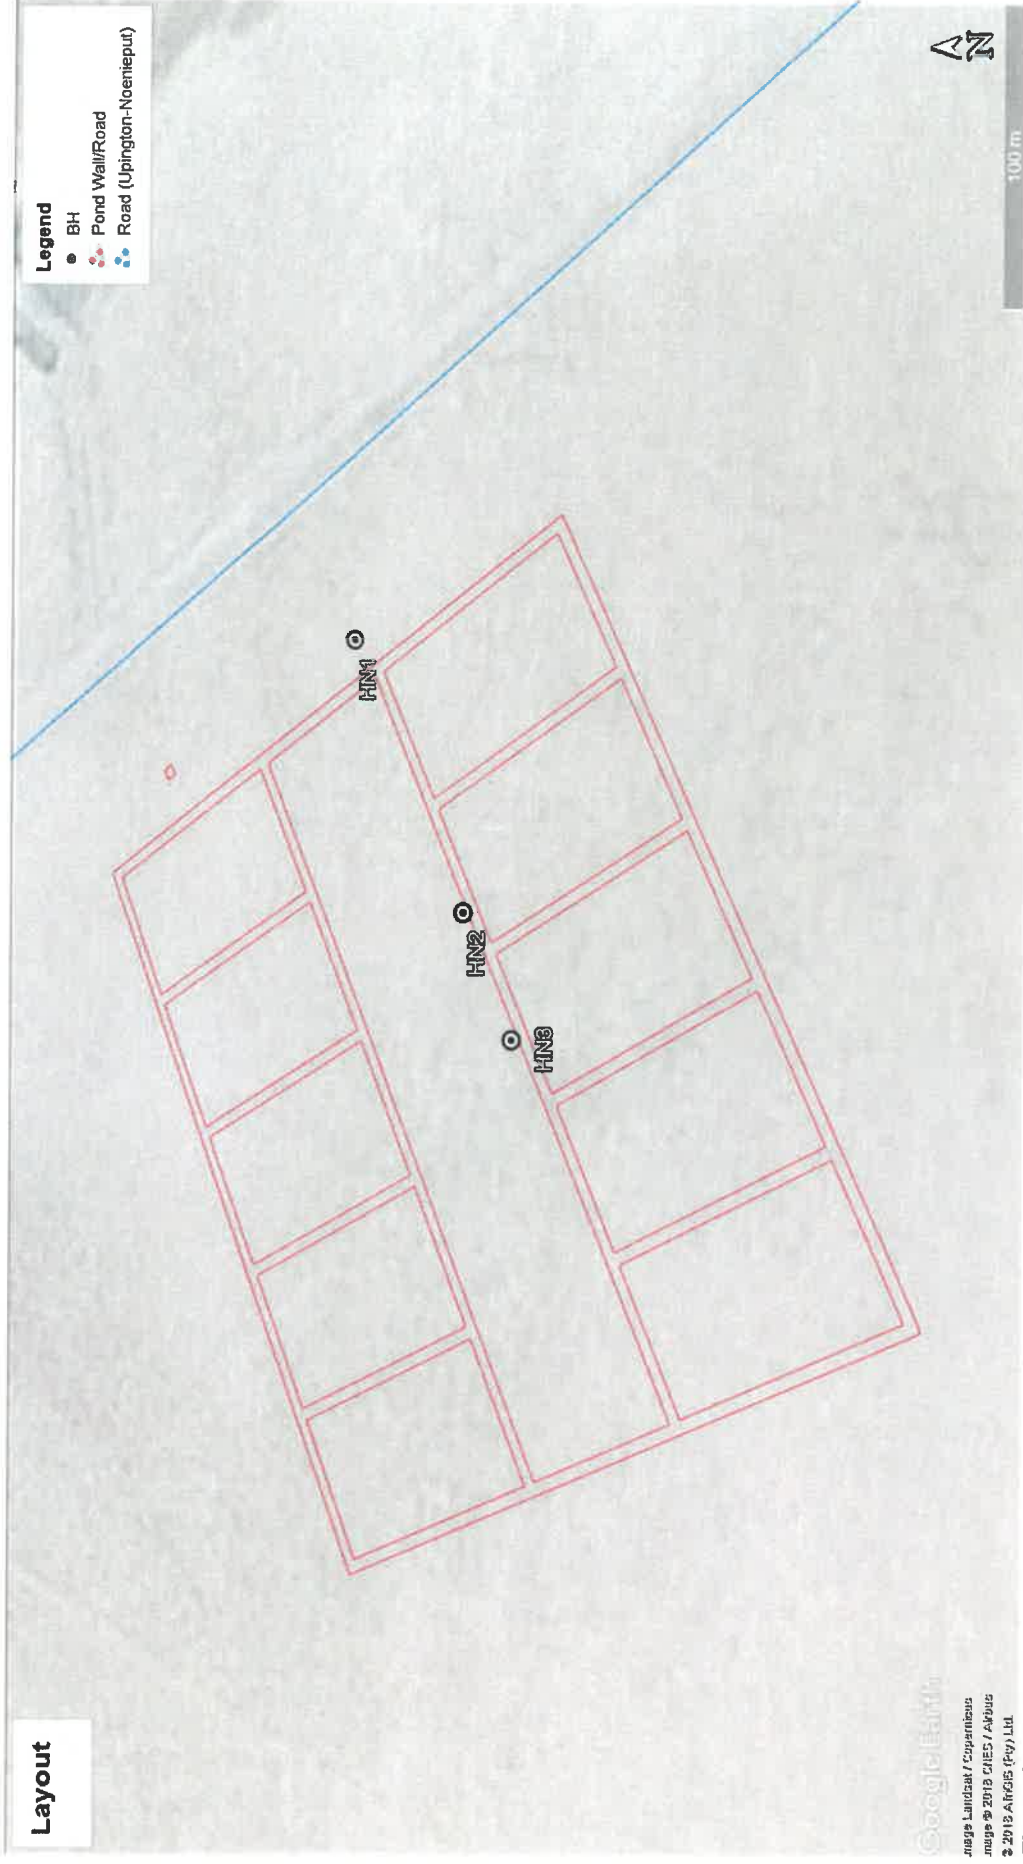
A plan indicating the overall location and extent of listed activities and main infrastructure on the mining site
